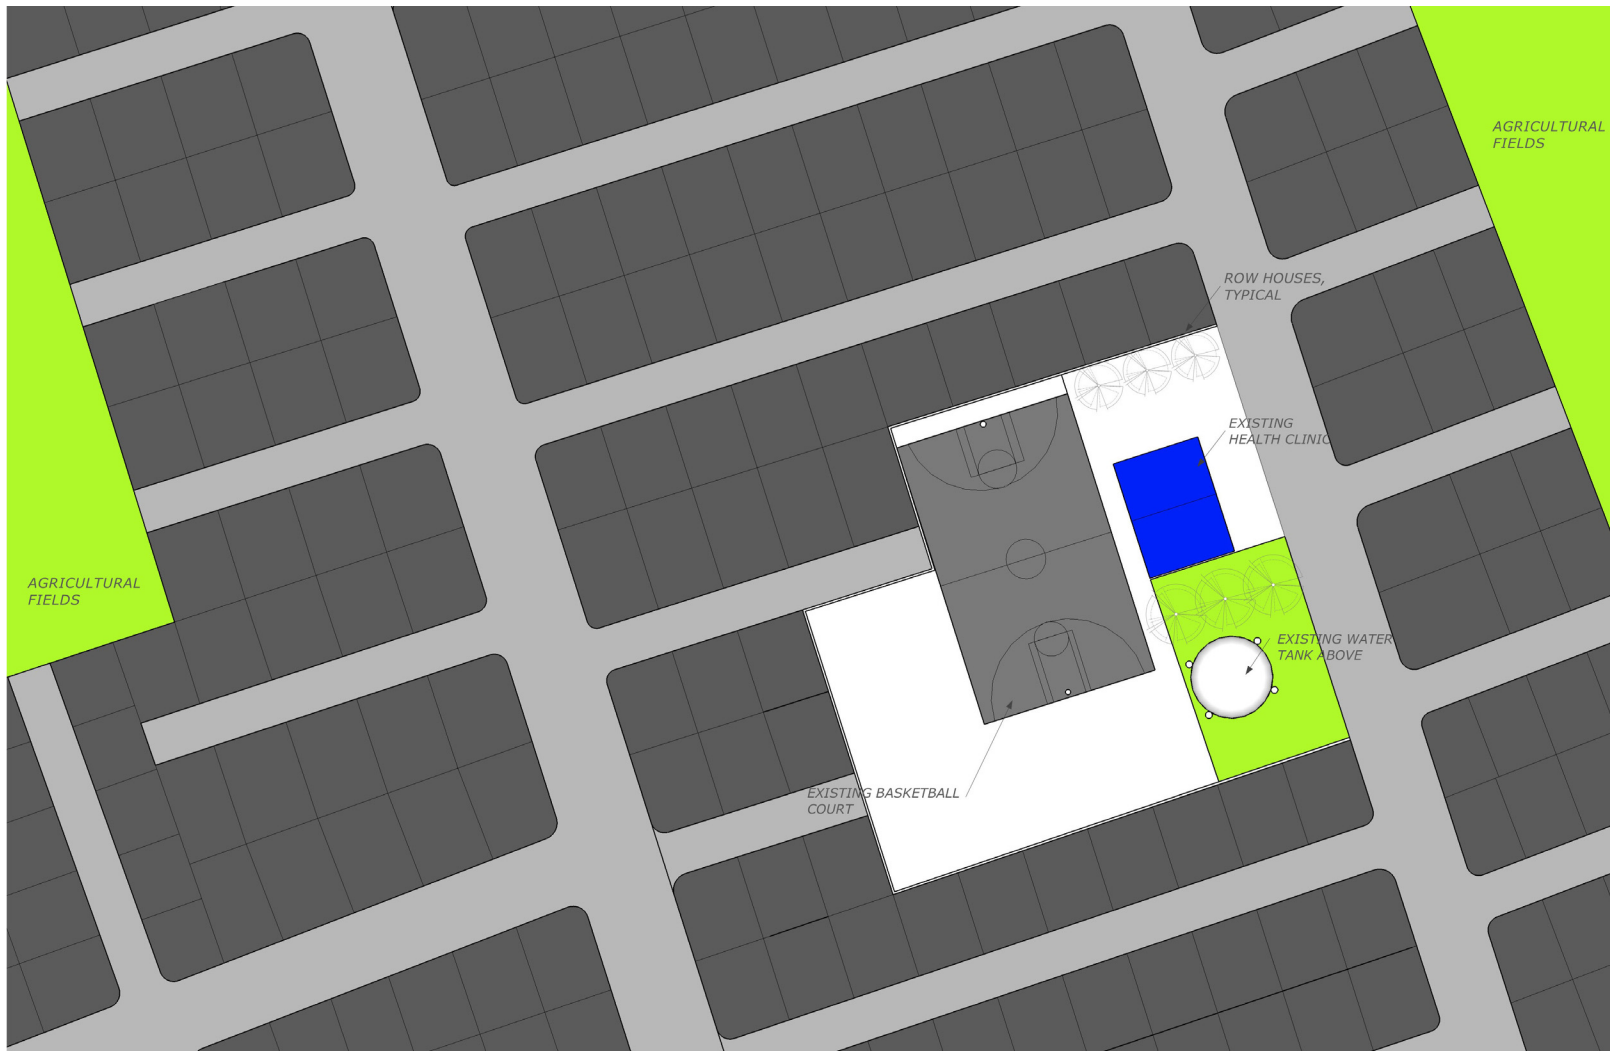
Existing Site Plan and Location of Health Clinic, Scale: NTS.
